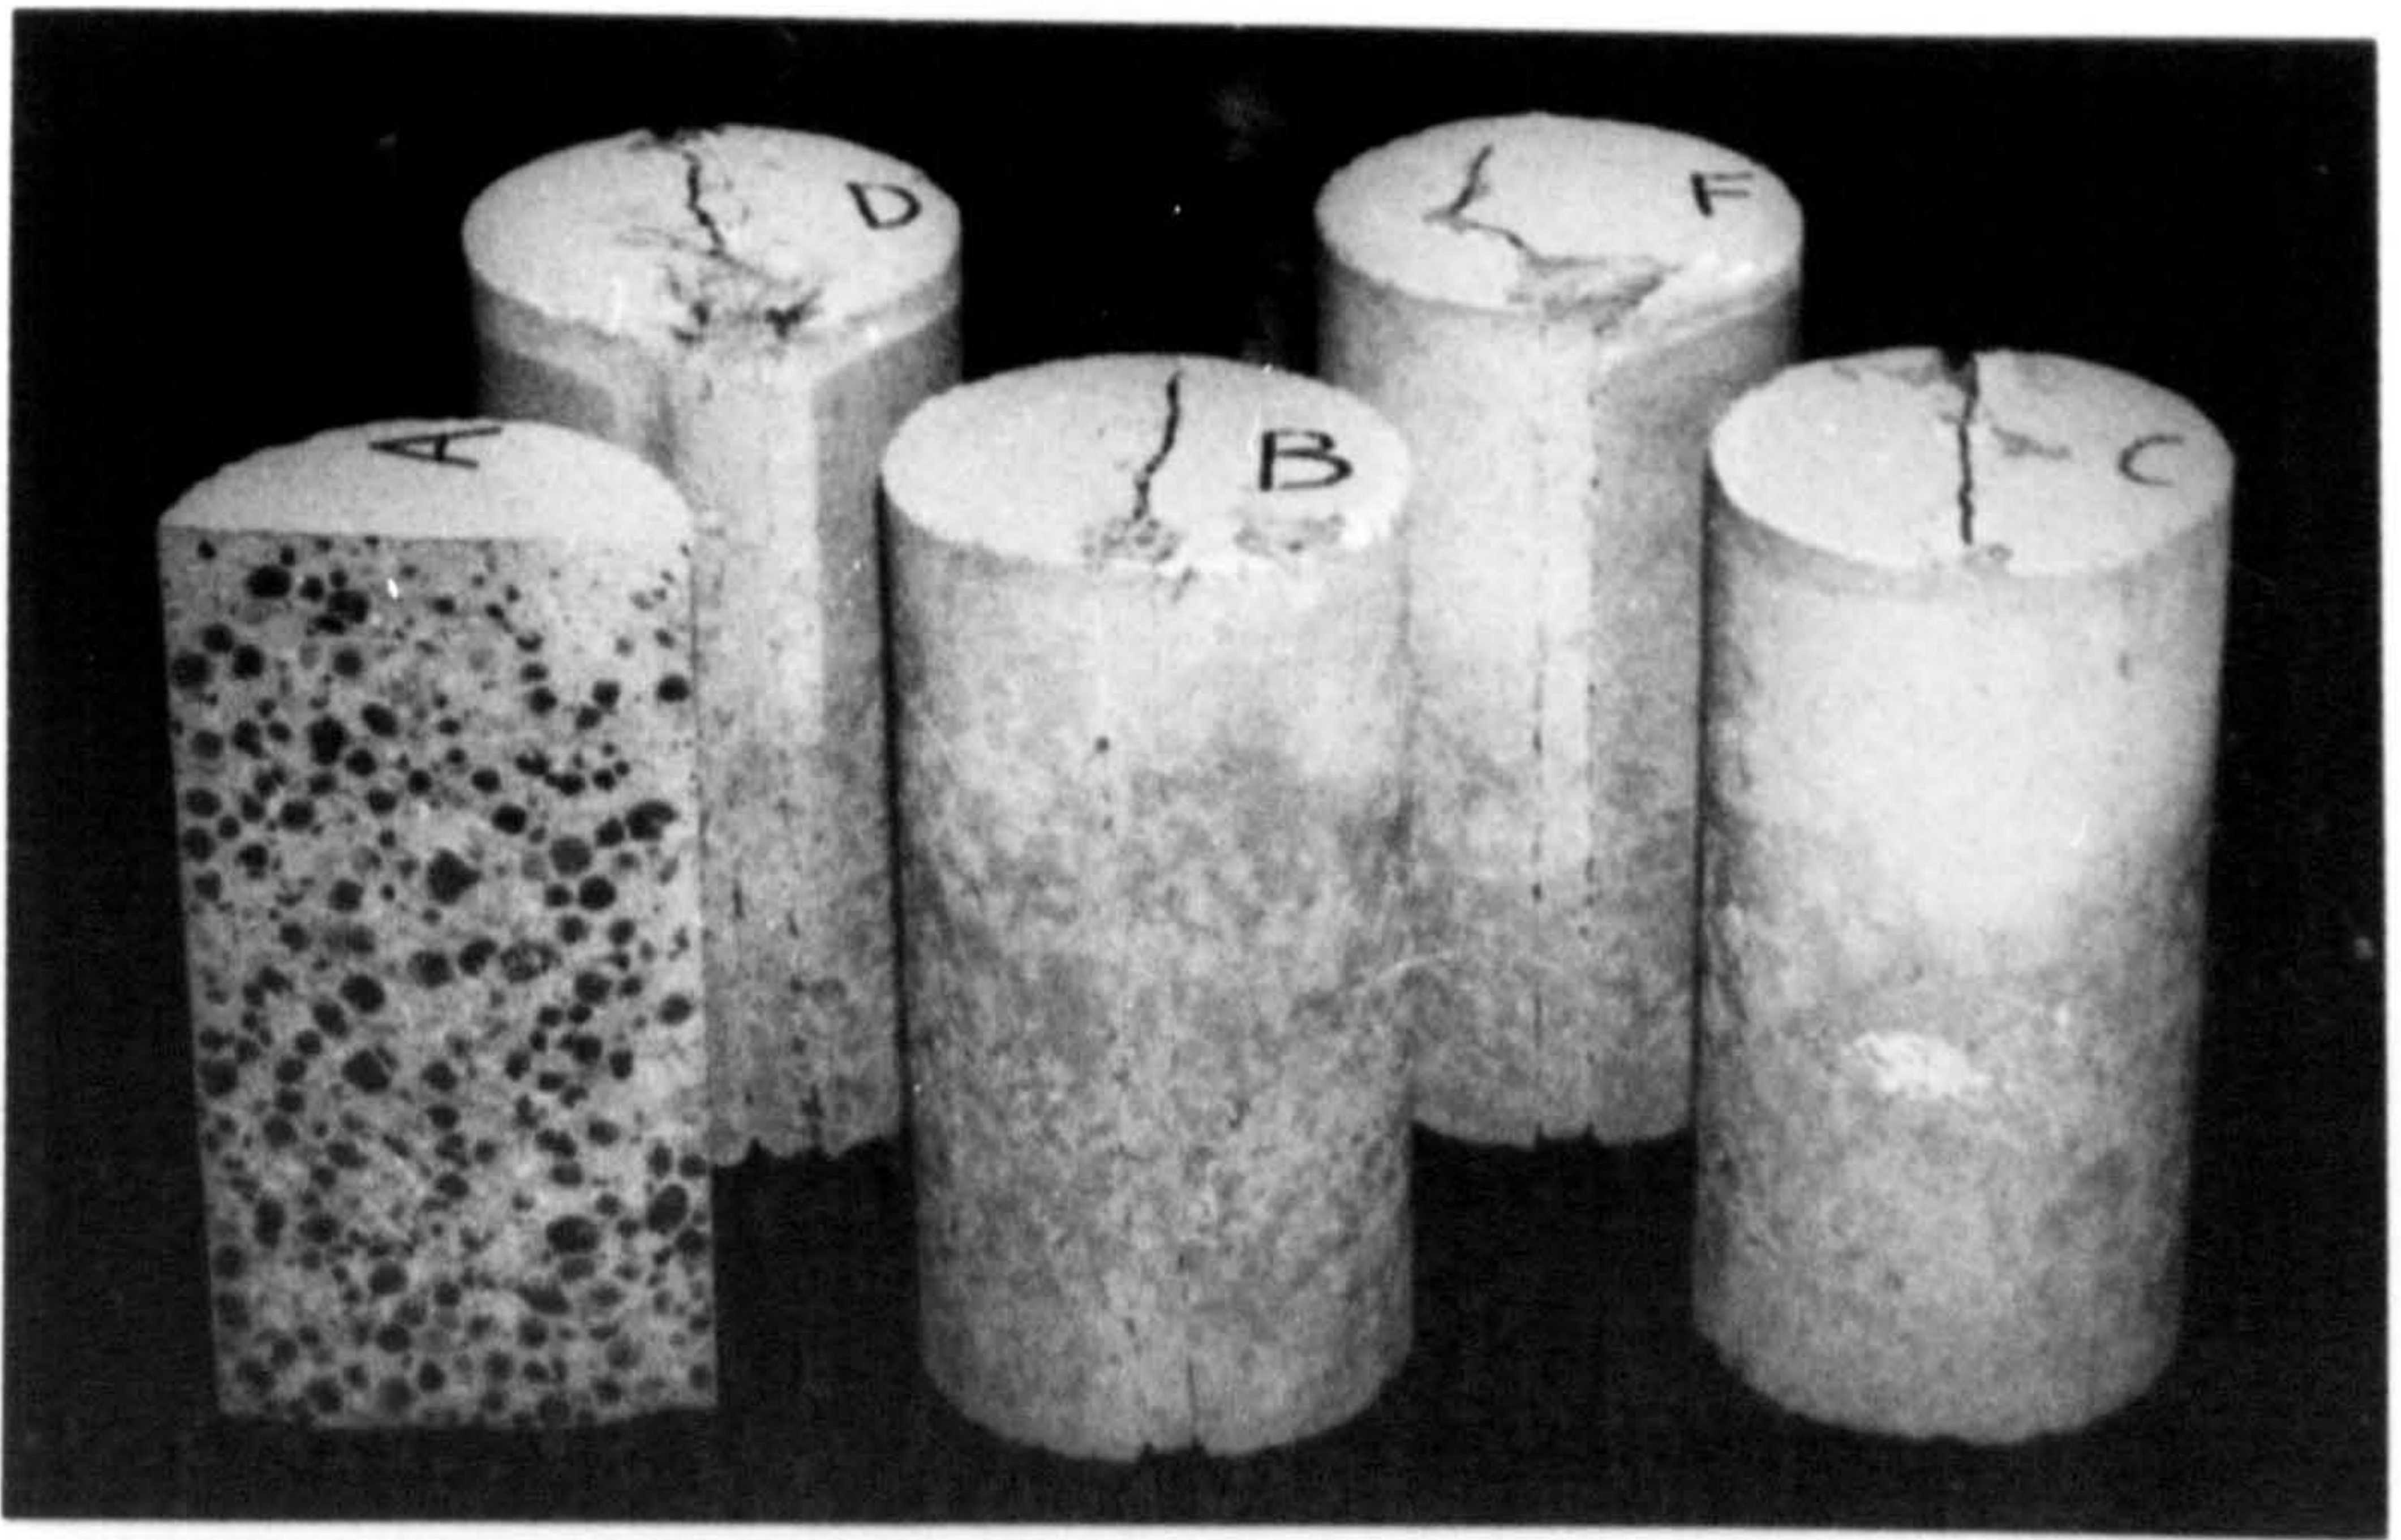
PLAIN AND FIBRE CONCRETE CYLINDERS
